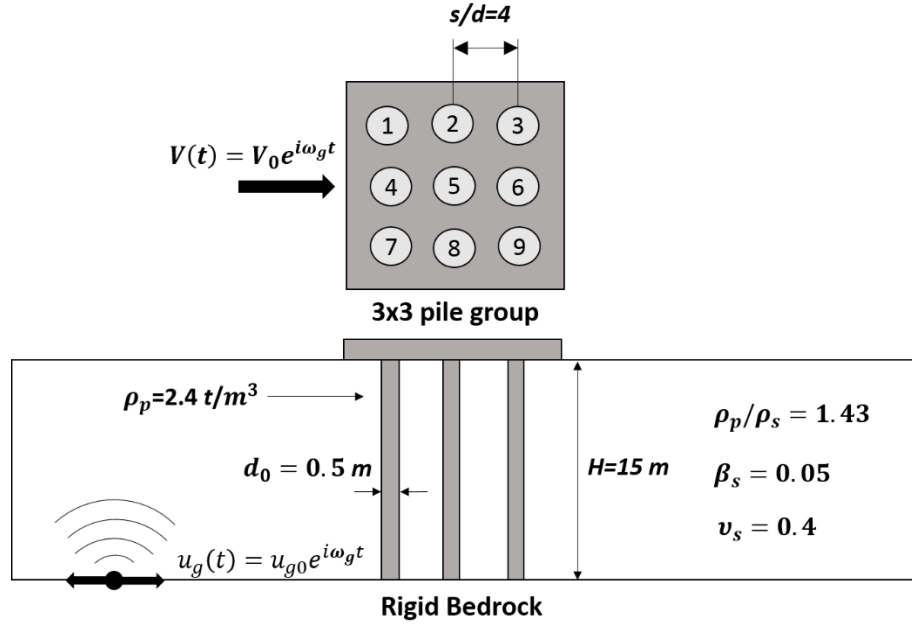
Cross-section of the 3×3 hinged pile groups and the used soil properties.
